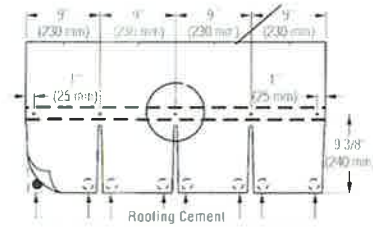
Fastening Hatteras Shingles on Steep Slopes
